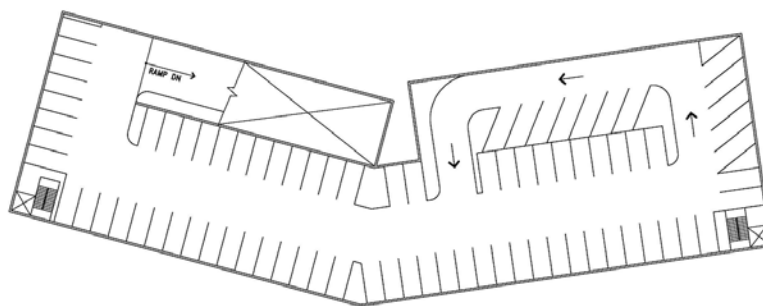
VFW Hall Property: Public Parking Garage Site, 701/637 Lake Avenue (Blocks 2406 and 2404)
